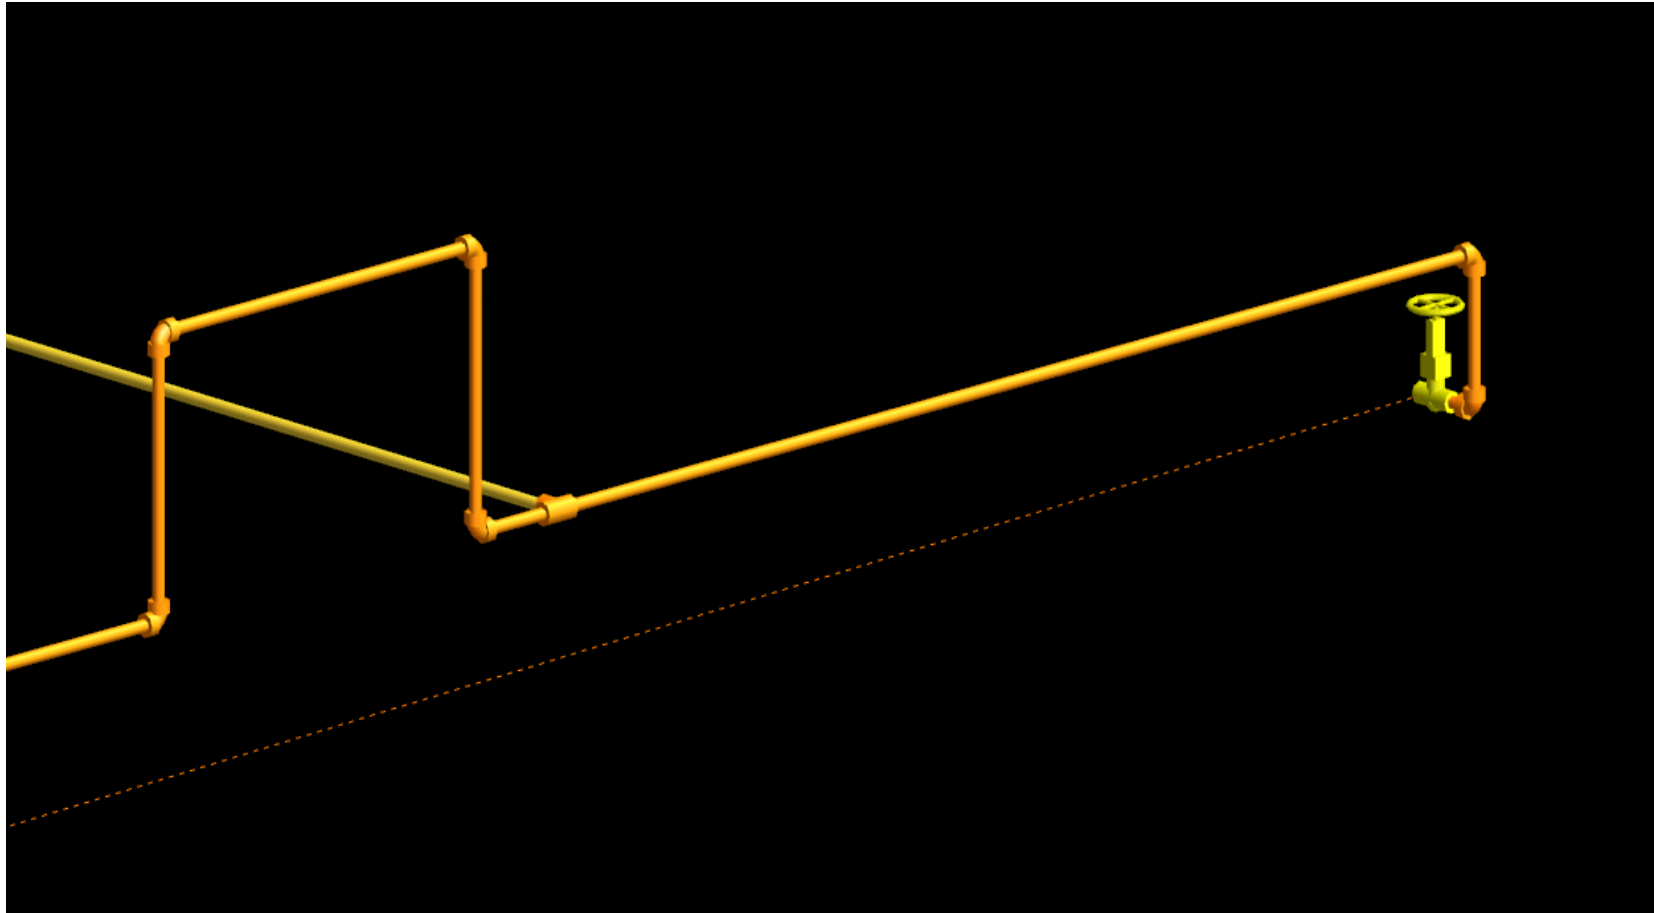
Tubing layout at Gas Engineering Lab (3D review)
